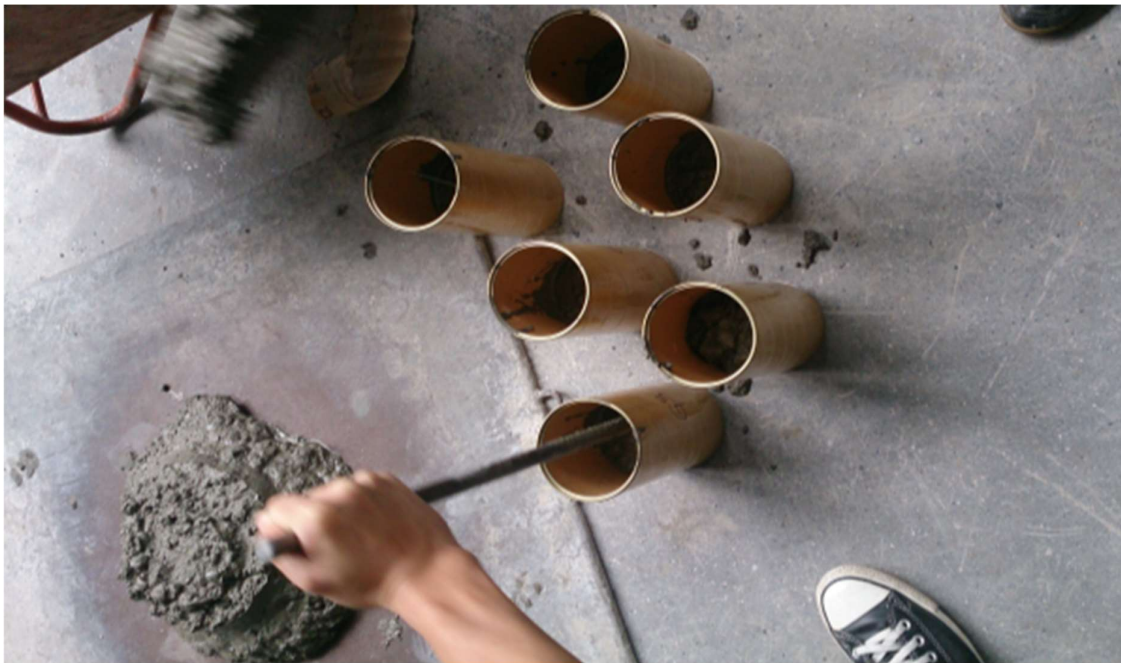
Concrete Cylinder Specimen Sample Preparation
